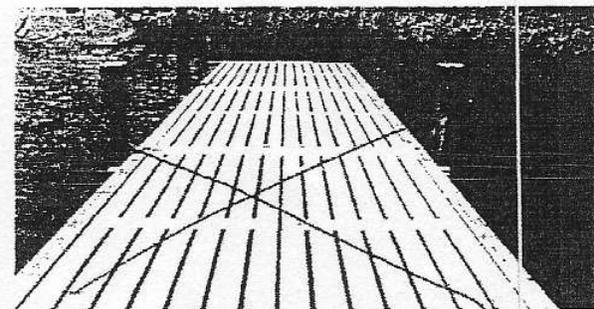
Proposed 6 foot wide dock to be of concrete surface construction with marine approved anti-corrosion internal reinforcing rebar.
